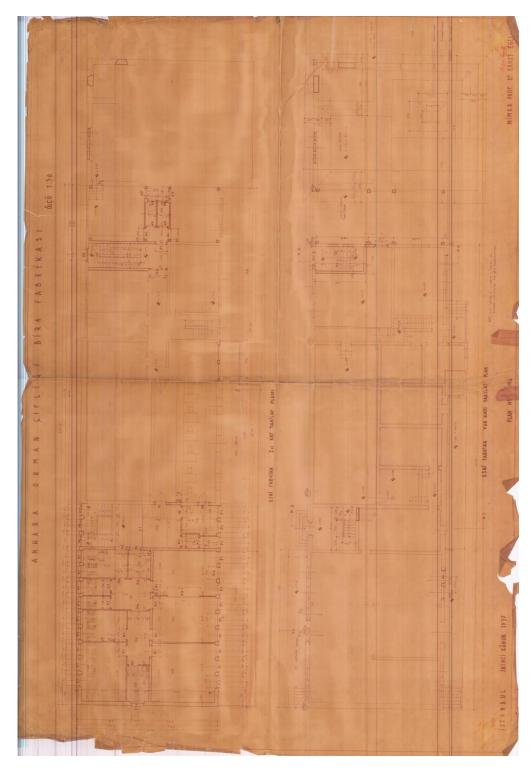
The repair project of the old factory building Egli, 1937 (Source: TTA Archive)
